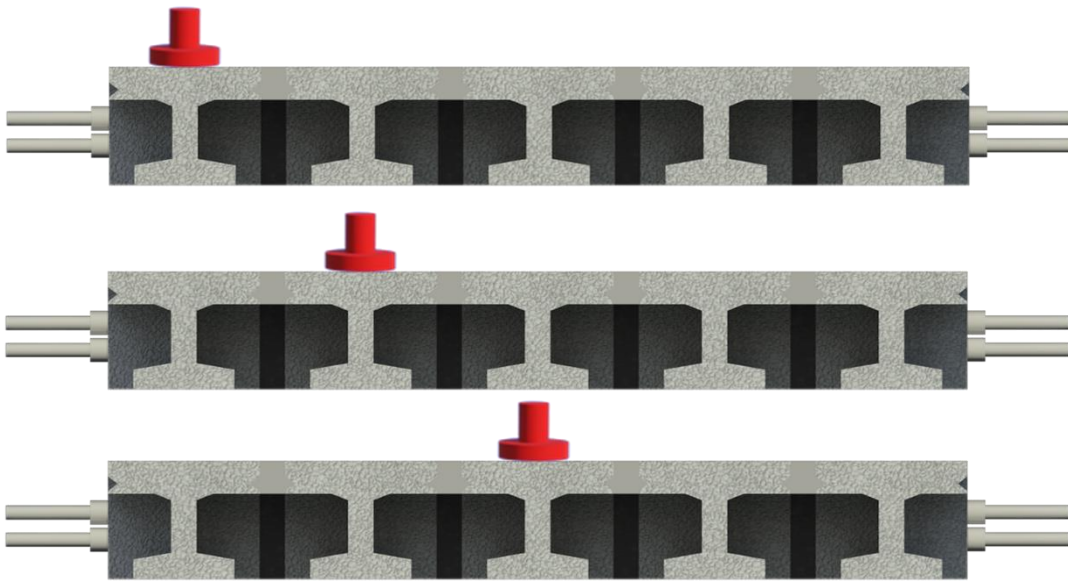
Sequence of application of service loads in bridge model on: exterior beam, first interior beam, and intermediate beam
